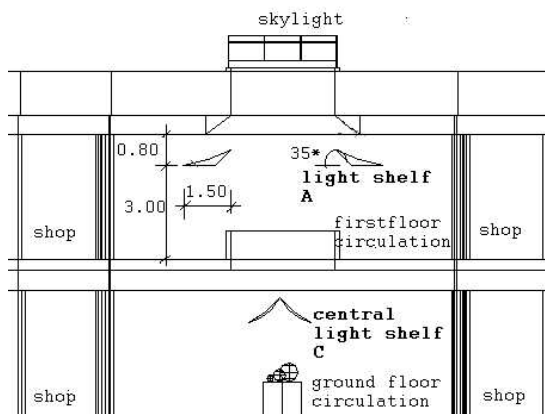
Transversal cross section in the studied area of the building, showing Light Shelf "a" (curved) in the first floor with central light shelf "c" in the ground floor.
